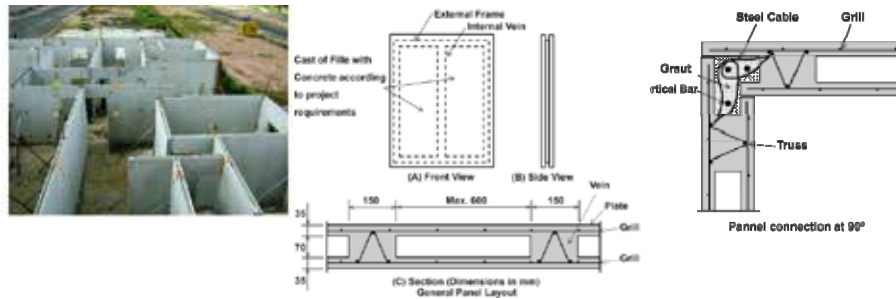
Built Panels on construction site and constructive details of the system Source: (BRASIL 2018)
